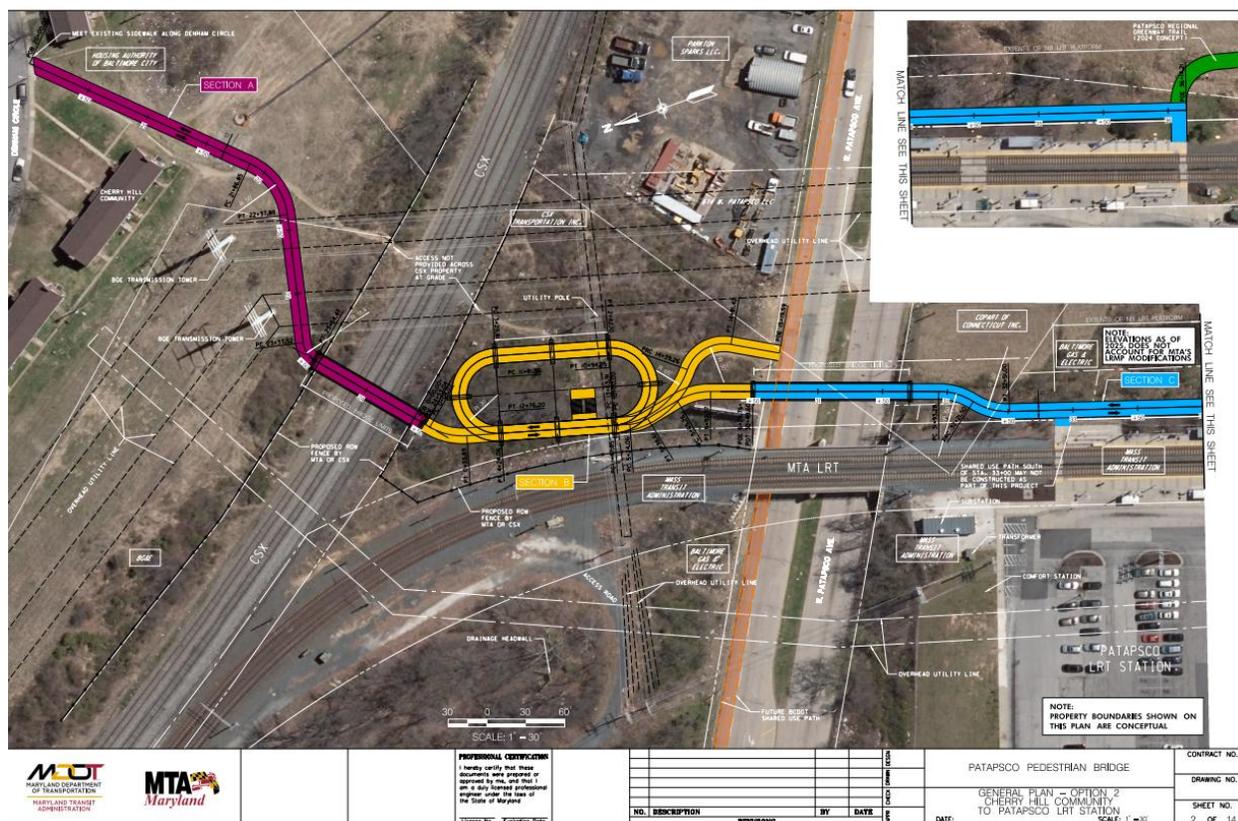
Patapsco Station Pedestrian Bridge General Plan
